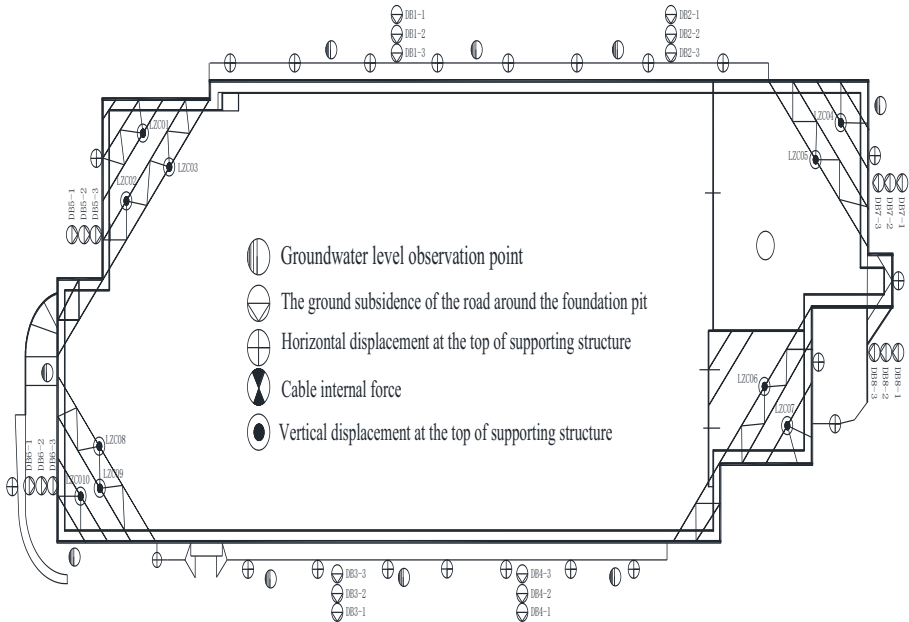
Supporting structure of foundation pit and plane layout of monitoring points.
